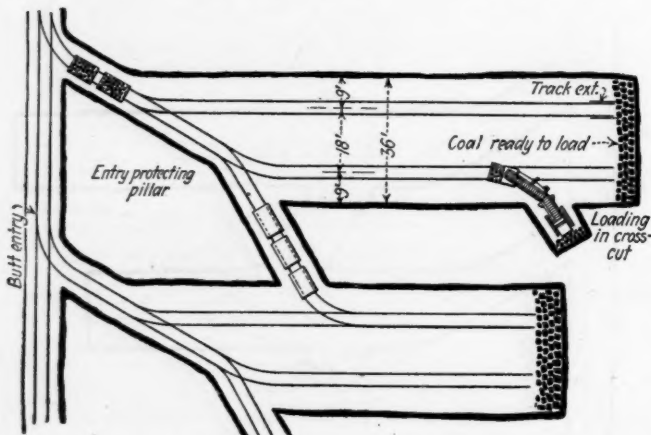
PLATE VI. LAYOUT WITH DOUBLE-TRACK ROOM
